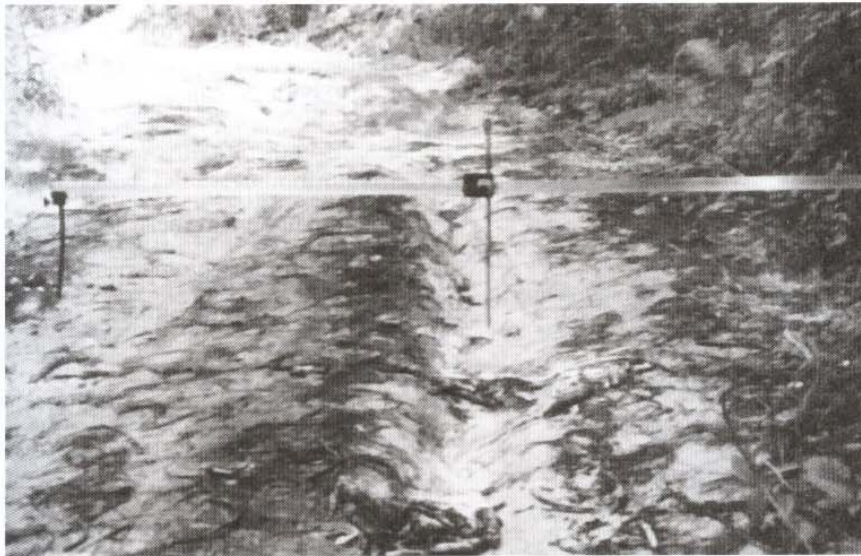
Vertical soil loss measurement on forest road by using erosion bridge
